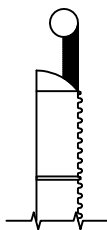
HEADER WITH REDUCING STUB TO TOP INTO TOP OF END CAP WITH HEADER INVERT AT OR BELOW CHAMBER INVERT.
